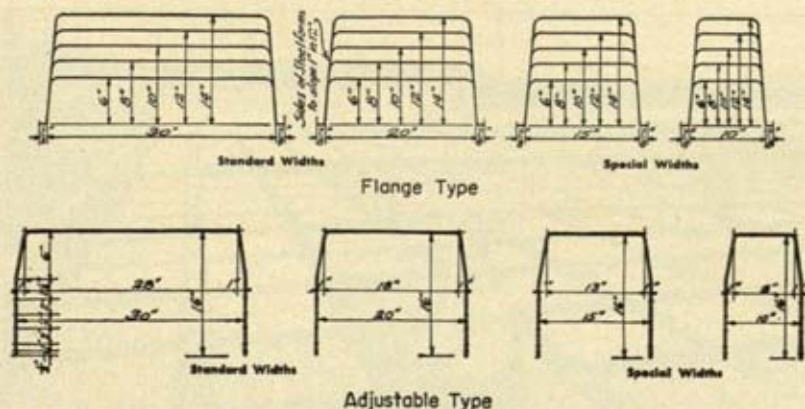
Cross-section dimensions of Meyer Steelforms. (*Ceco Steel Products Corp.*)
